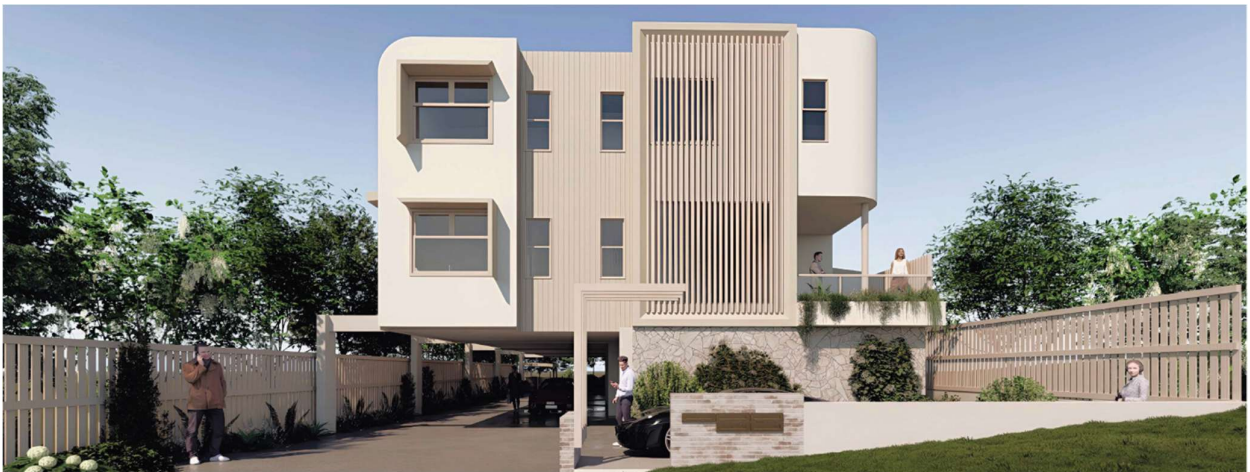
Townhouse Render (Tarun Jangra Building Designers, 2026)
